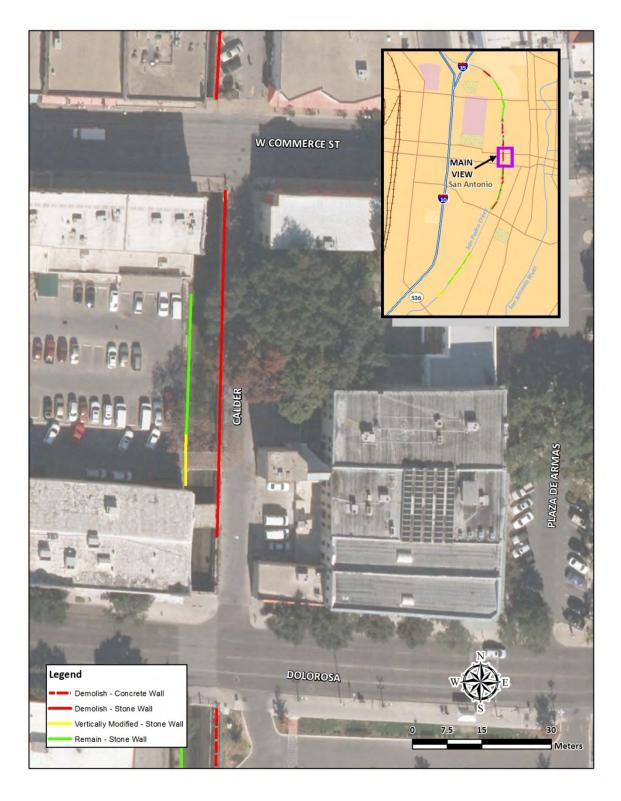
Proposed impacts to the west and east bank retaining walls between West Commerce Street and Dolorosa Street.
